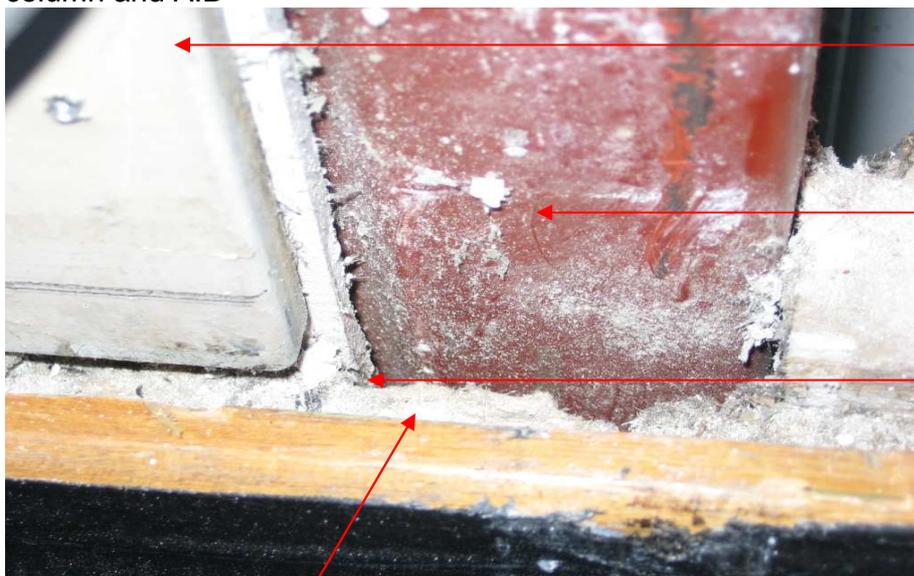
Metal clad column showing gap at front of column where the two halves of the cladding meet.
